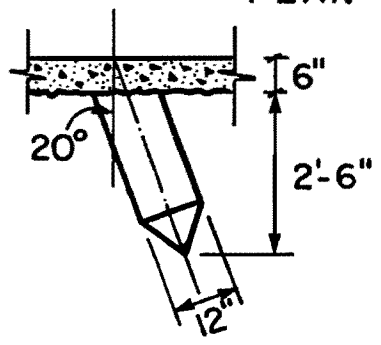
Abutment for highway pavement at Bourg-Servas, France (Ref 56).
